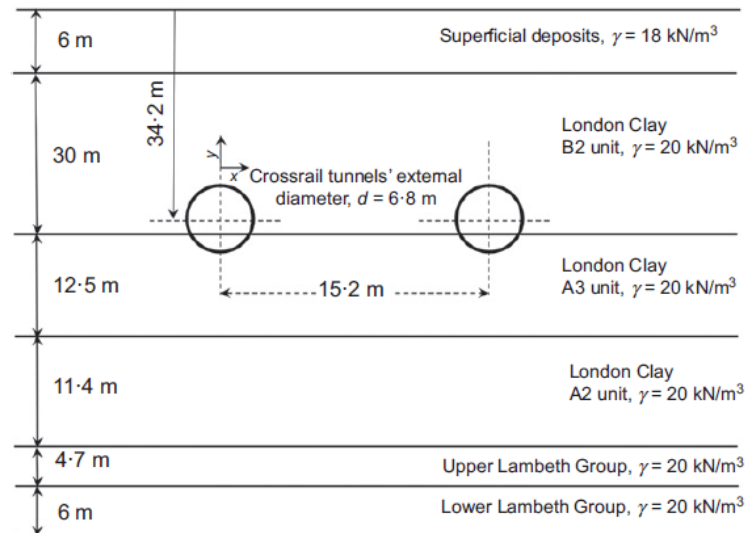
Soil profile and general geometry adopted for the analysis of the Crossrail tunnels at Hyde Park site (Avgerinos et al., 2018)
